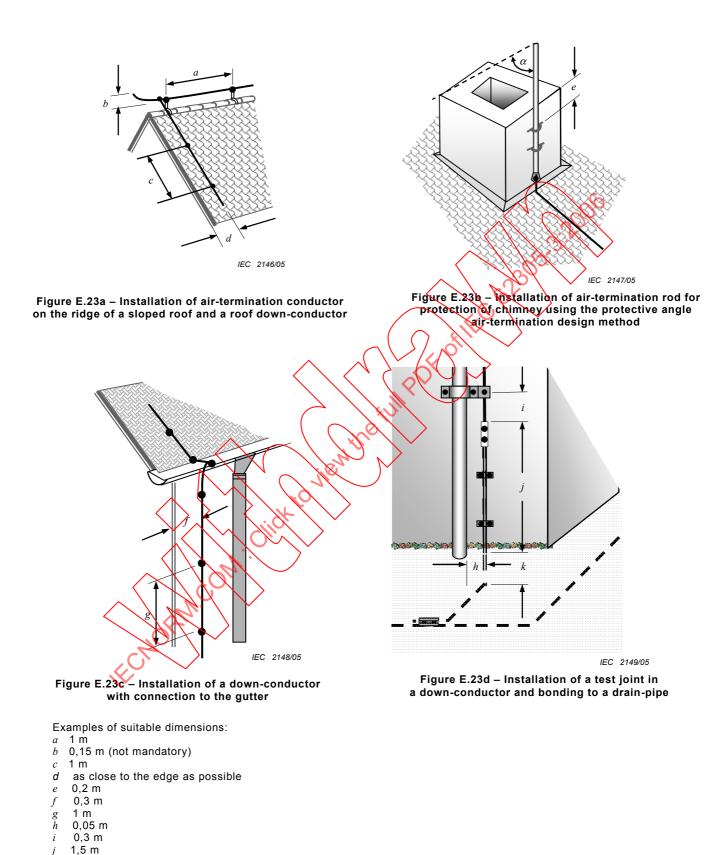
Some examples of details of an LPS on a structure with sloped tiled roofs
